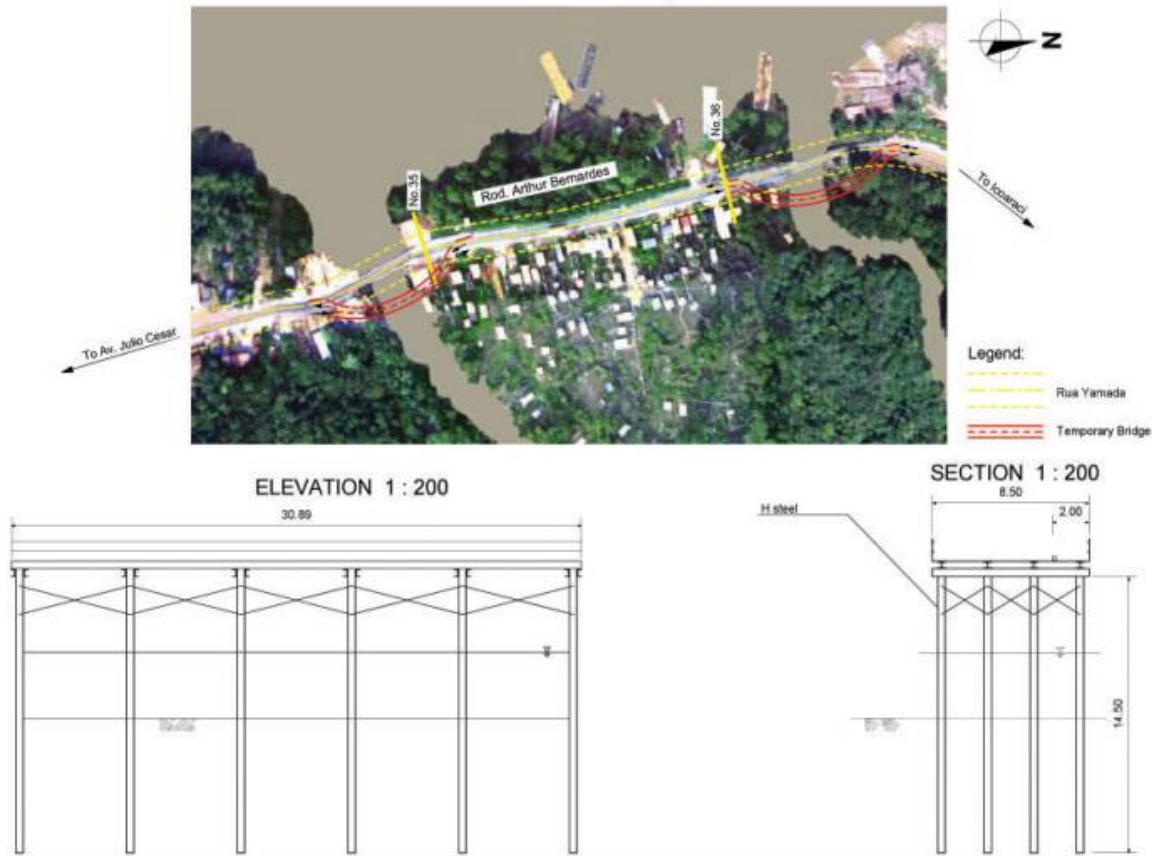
Traffic Diversion and Temporary Bridge
